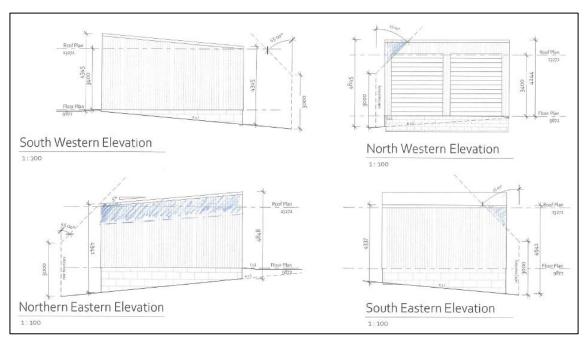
Elevation Diagram (source: Trish Pickersgill 2023)
